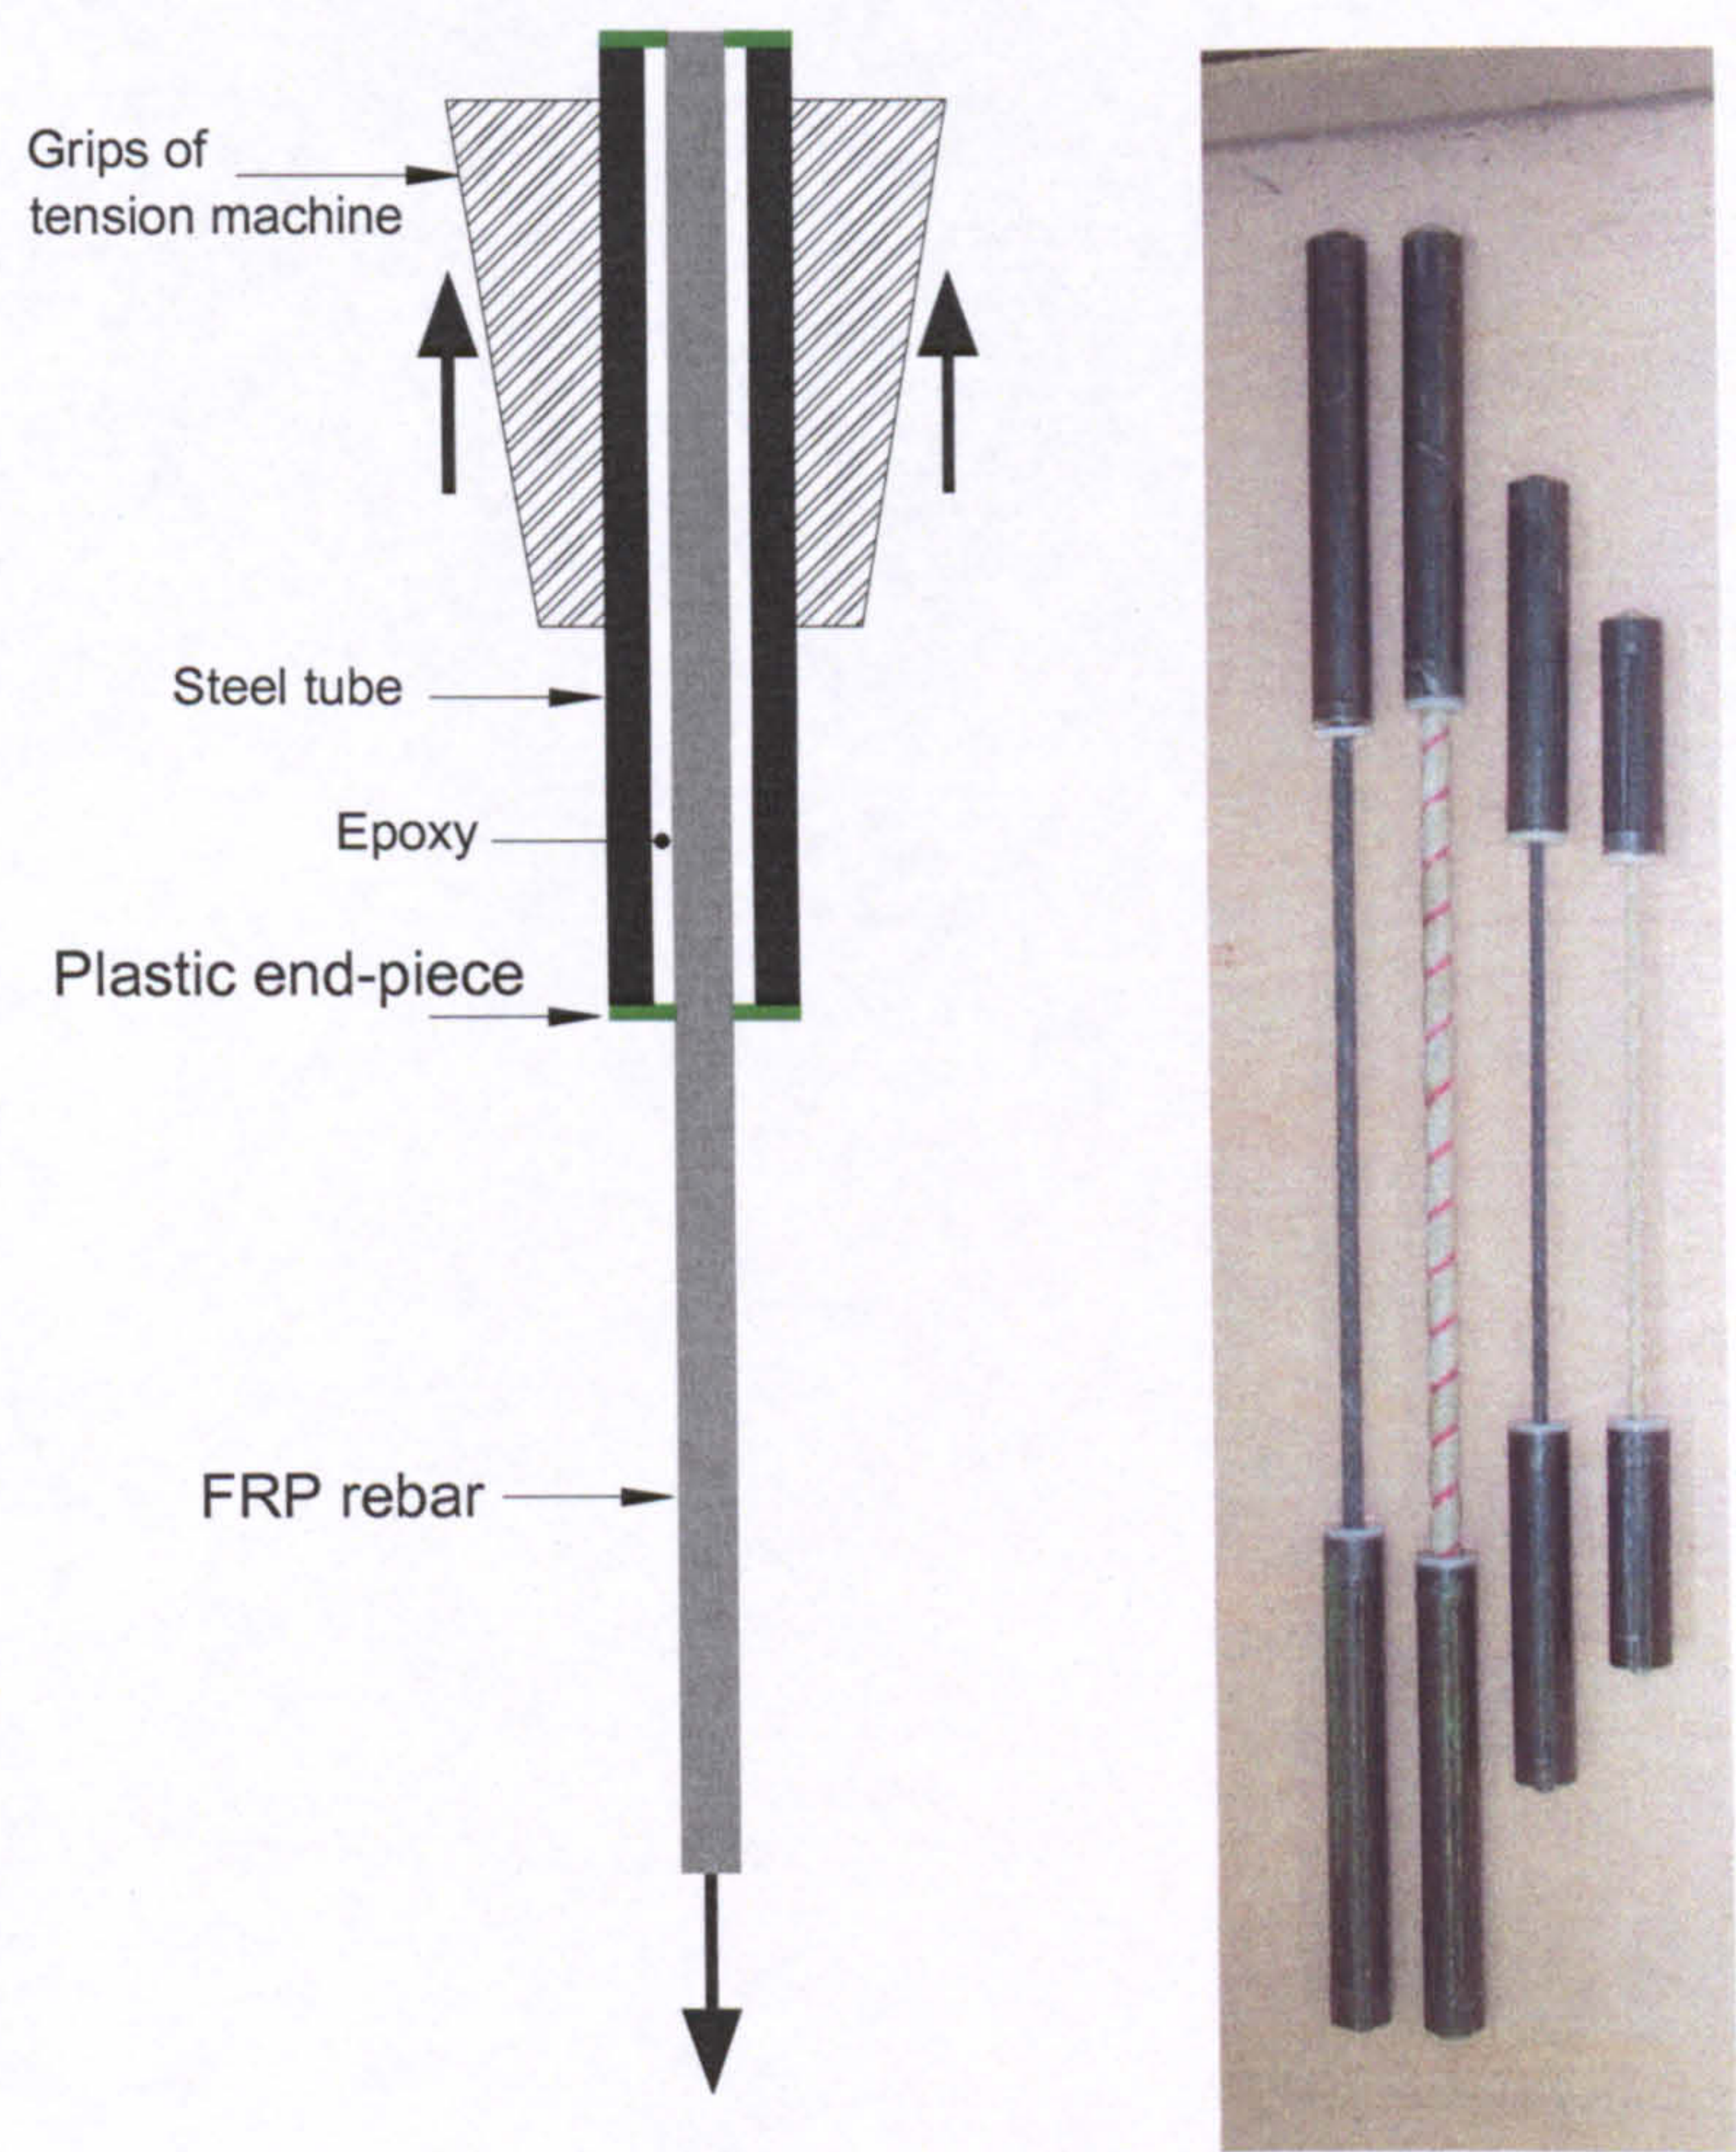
Steel tube end-anchorage for tensile tests of FRP rebars.
